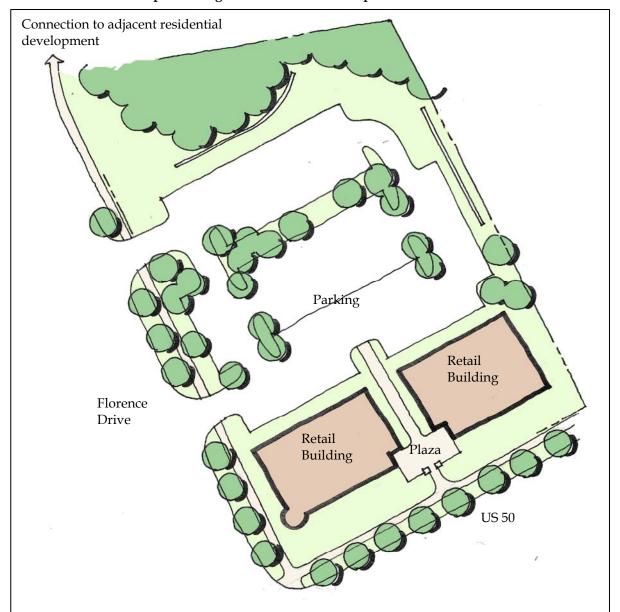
Site 4 - Proposed Neighborhood Retail Concept
